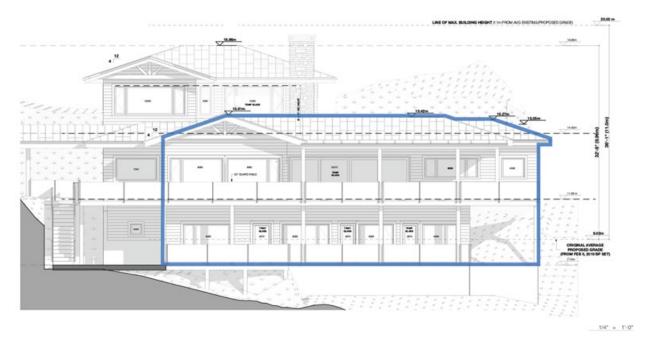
Drawing detail (west end of building) – not to scale/elevation; for illustration only
